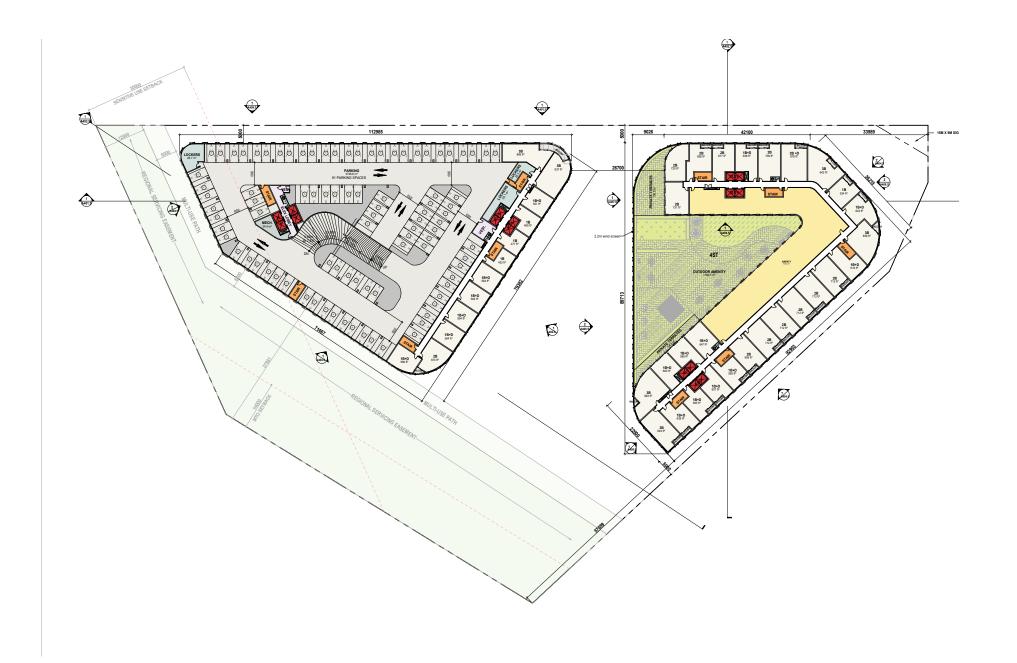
Level 5 Floor Plan (BDP. QUADRANGLE ARCHITECTS LTD.)
